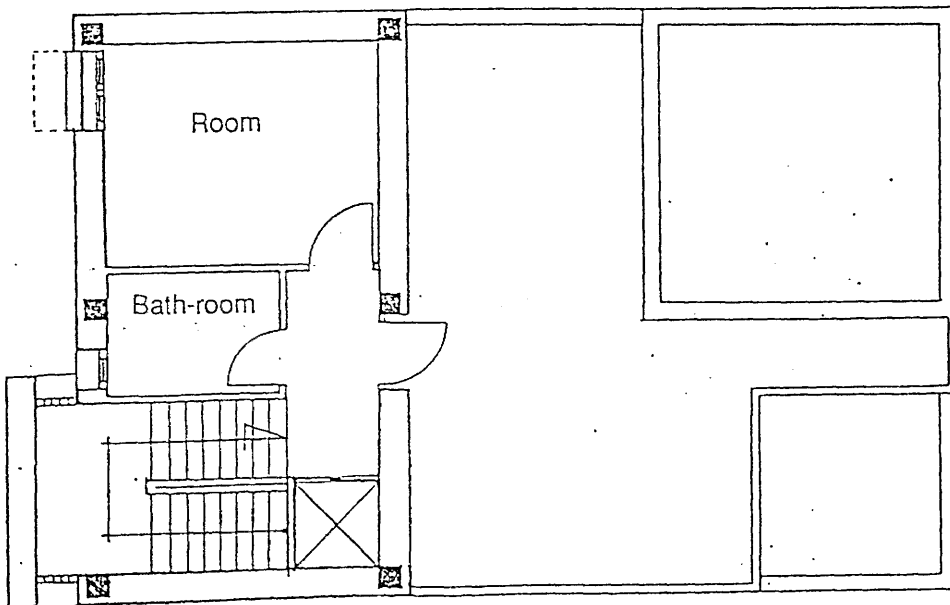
3 Bedrooms type, first-floor. Same ground-floor as (Fig.5-4-a).
